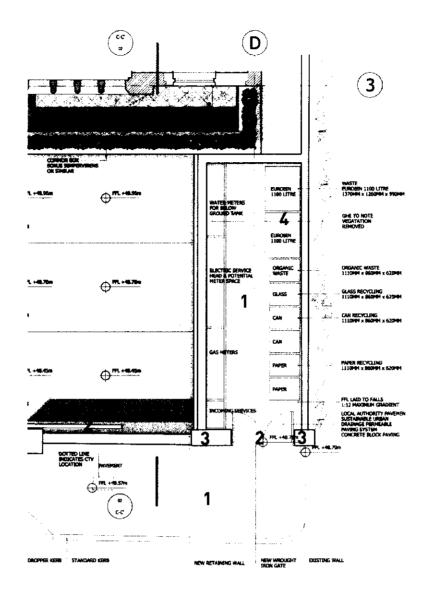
Netherhall Gardens Dedicated Refuse Storage Space
